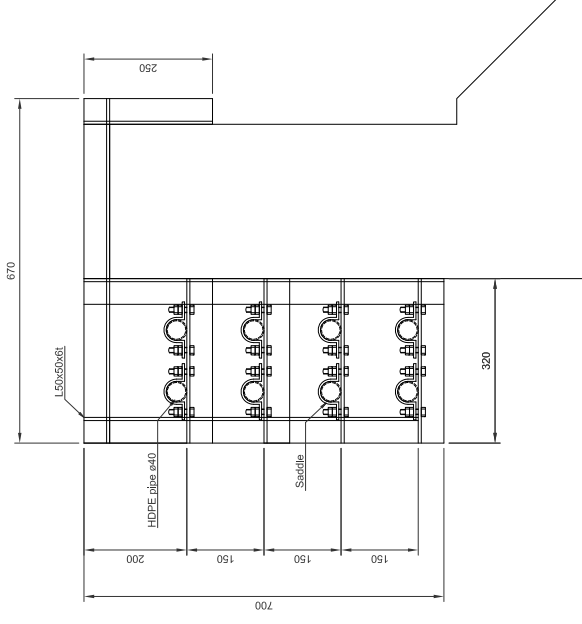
# DETAIL OF COMMUNICATION DUCT ( TYPE B1) ON BRIDGE
